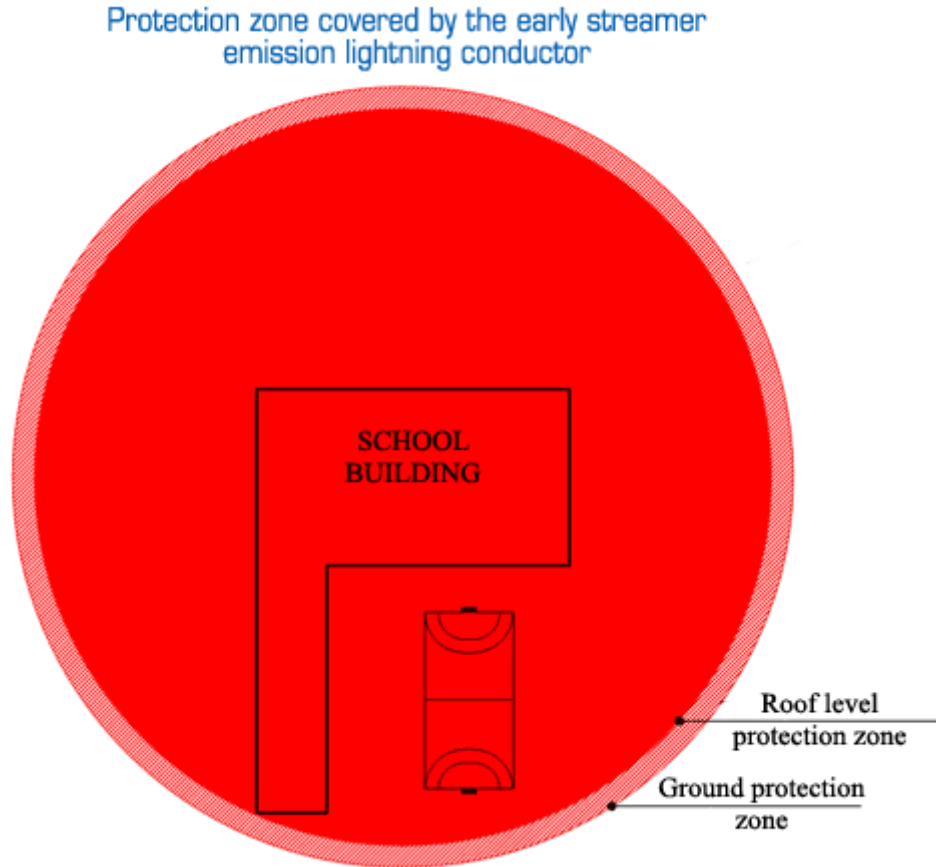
The claimed protection zone provided by the single ESE lightning rod for the school building and surrounding area. (Source: GIMELEC)
